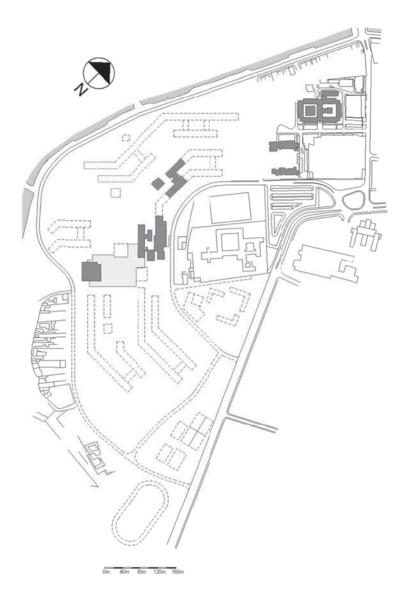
The Campus in 1987—dark grey: existing buildings; light grey: central square; dashed: first plan of the Campus.
